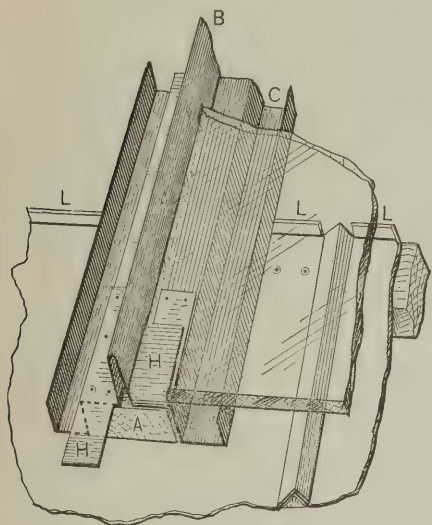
Perspective View of Skylight Bar at Bottom, Showing Glass Overlapping Iron.
